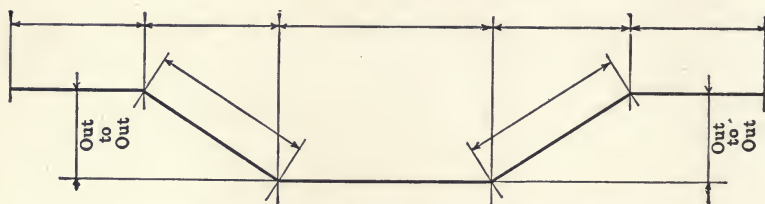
Bending Sketch for Beam or Girder Bars.
